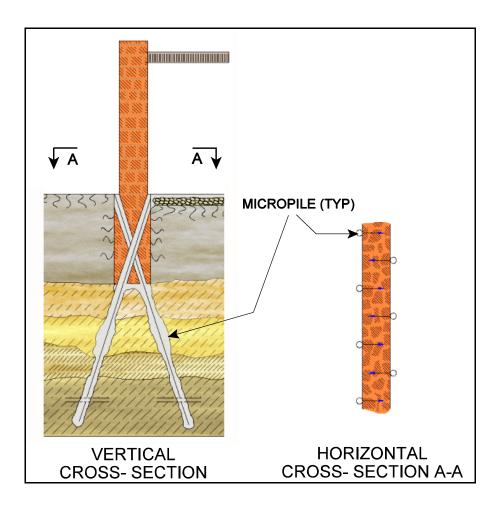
2. Classical Arrangement of Root Piles for Underpinning
